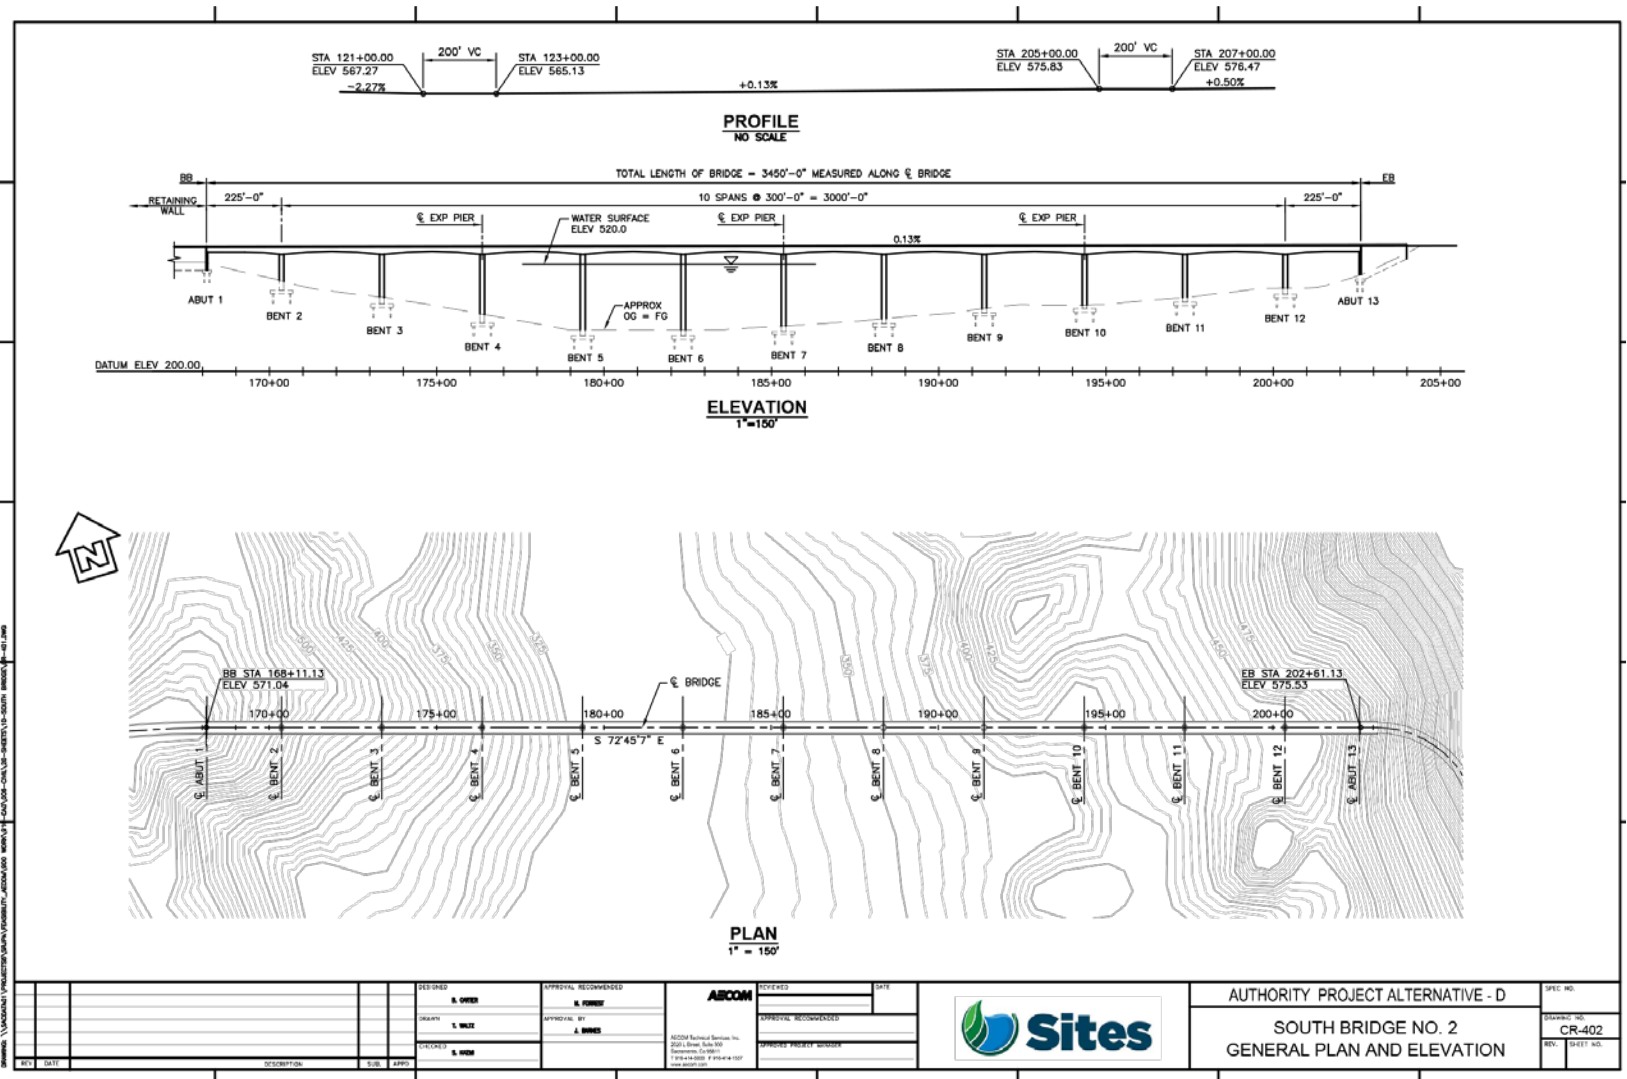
South Bridge Plan and Profile, Sheet 2
